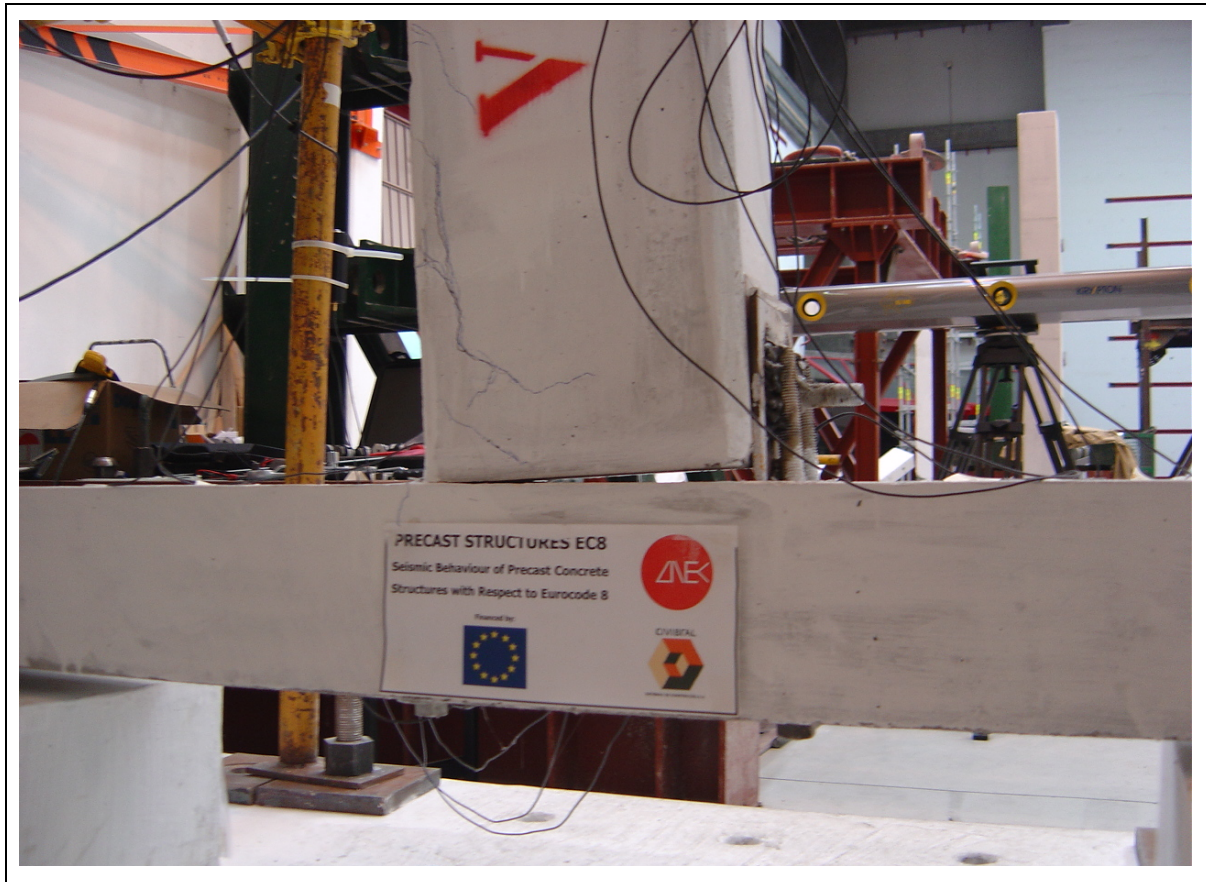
Specimen V4 – Detail of large gap between the column and the beam.
